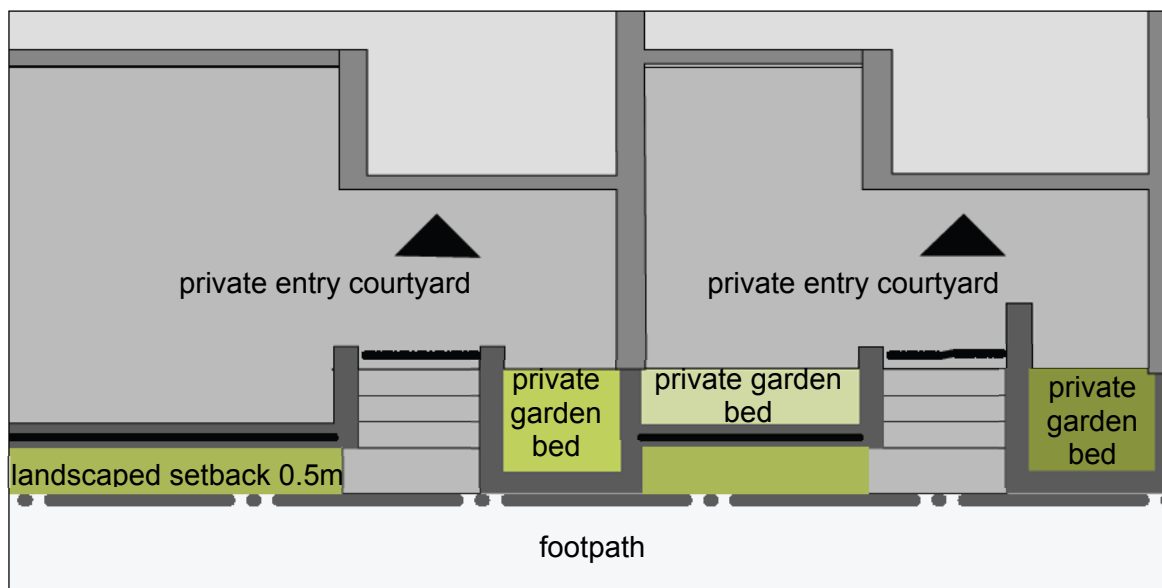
indicative landscape plan detail – typical front setback plan to primary roads
